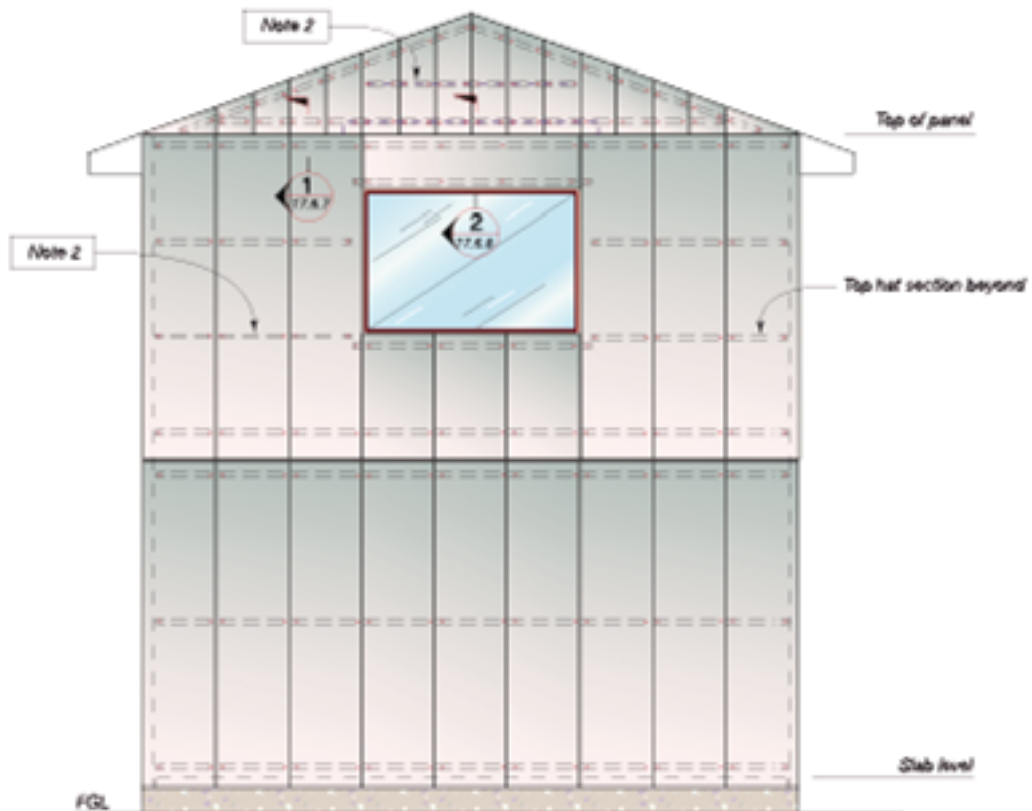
Two Storey Construction - Isometric View Detail
